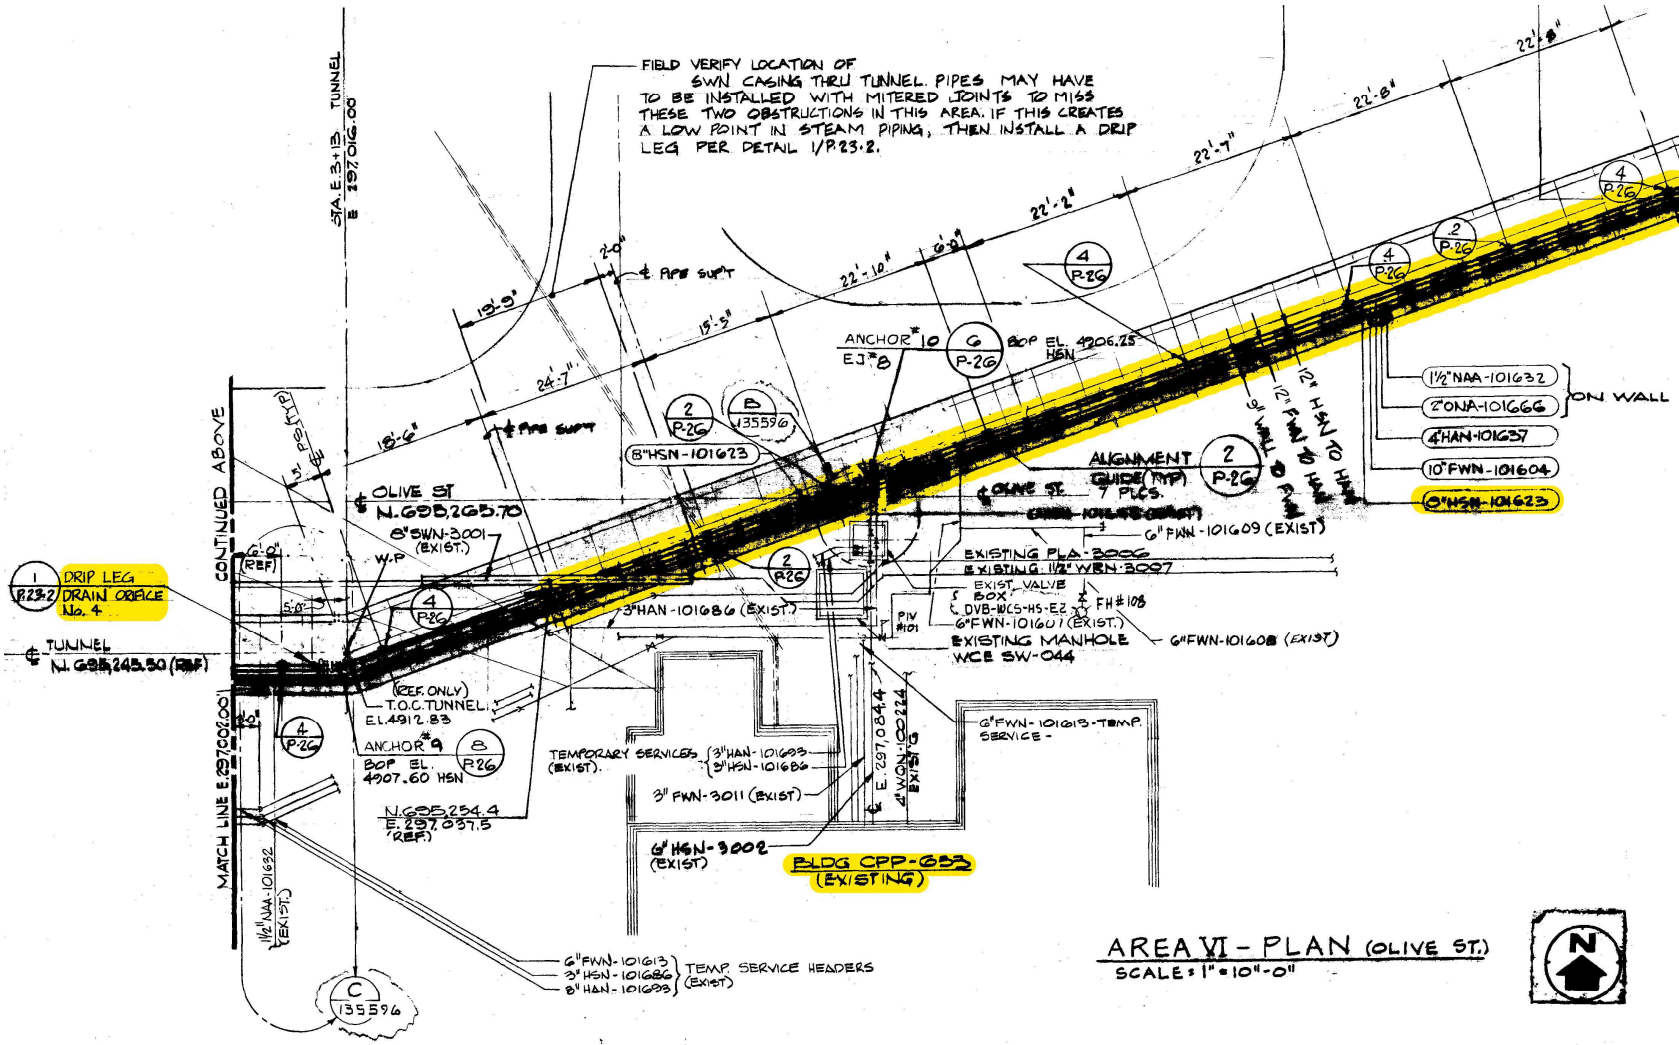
Plan view of the steam line in the utility tunnel (from Drawing 135548).
